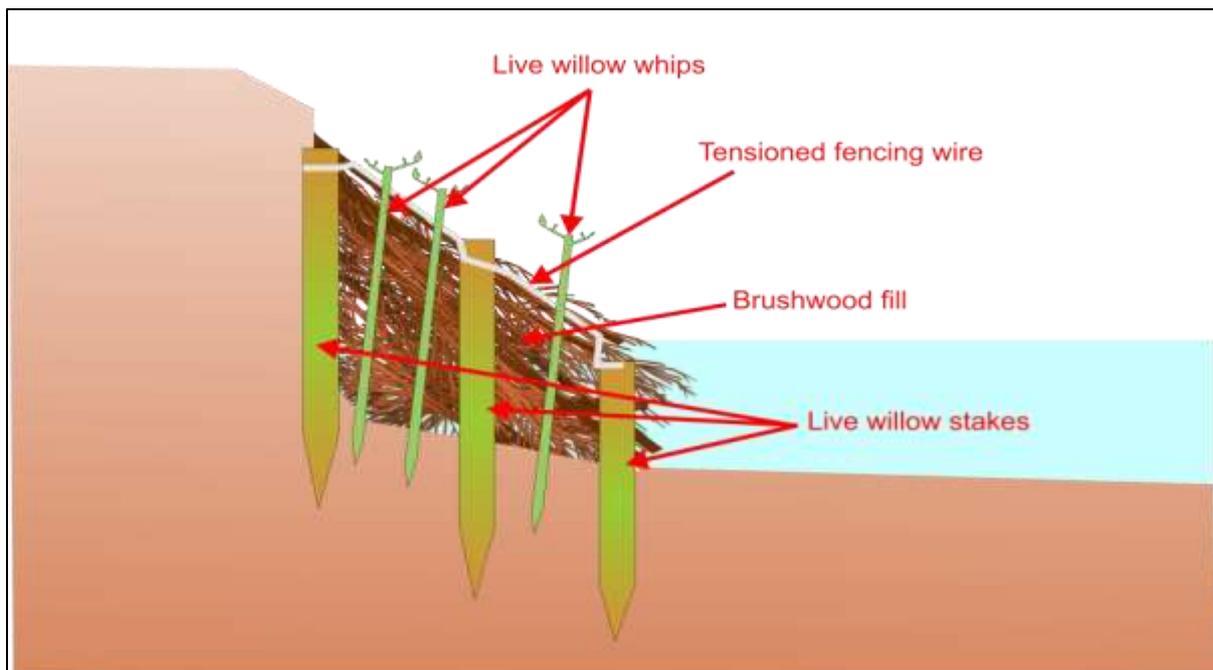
A cross section illustration of a brushwood erosion protection installation with live willow
